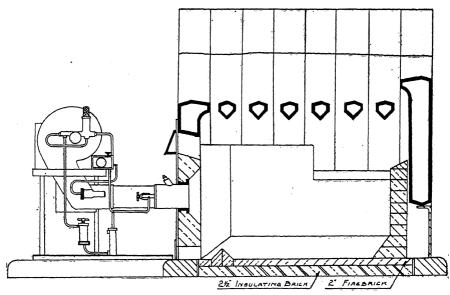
Automatic oil burner applied to a sectional hot-water boiler
